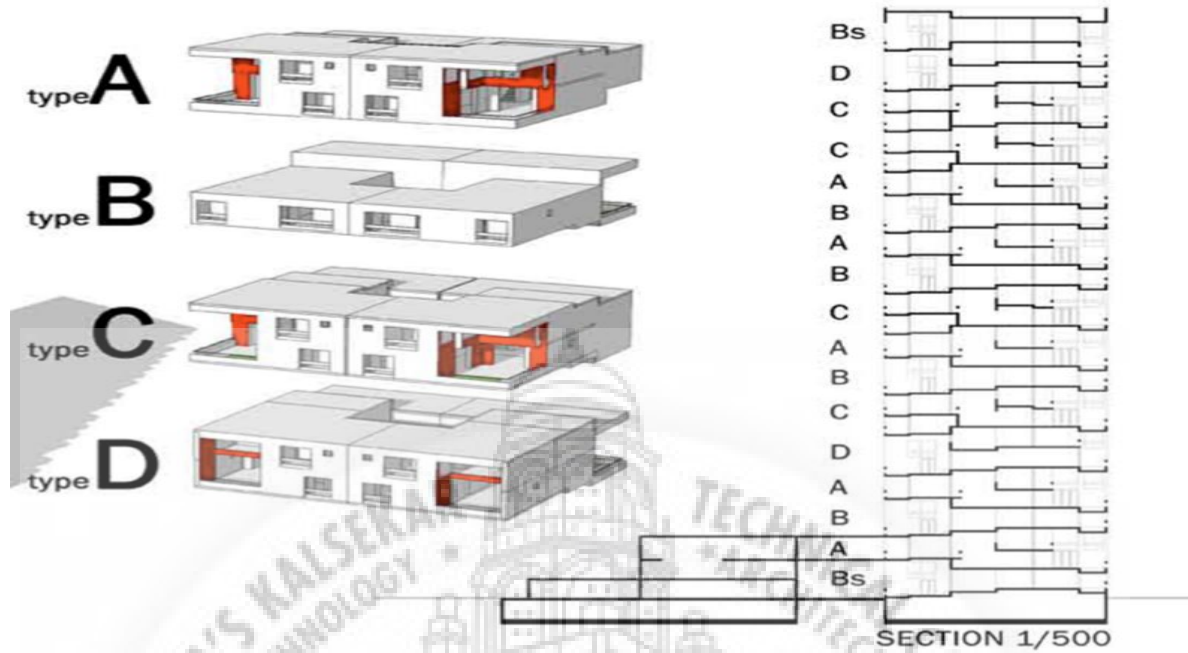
Kanchenjunga Apartment Building section (Source- architectopedia)
